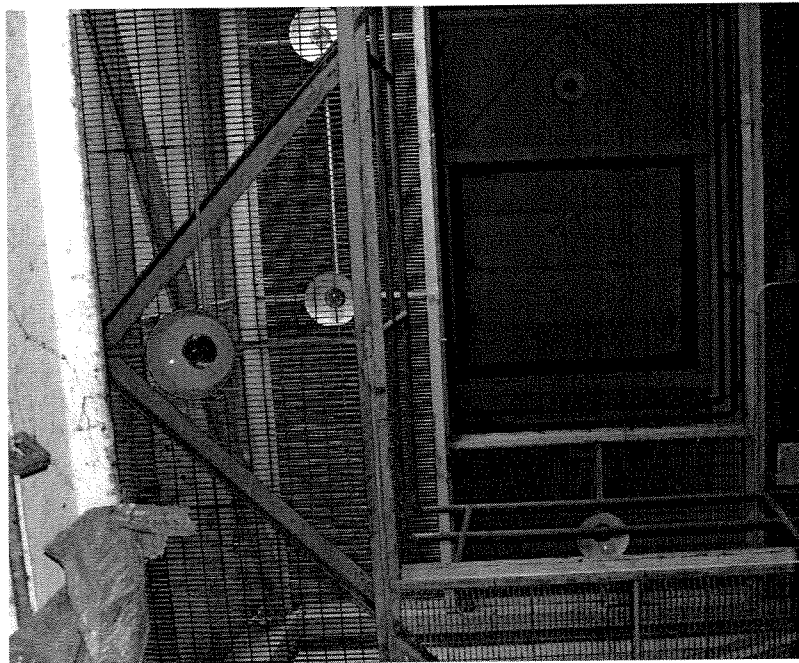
Beta Support Office No. 2 (Unit 141), Beta Test Complex, 1963-1964. Interior. Looking northeast. View of May 2005.
